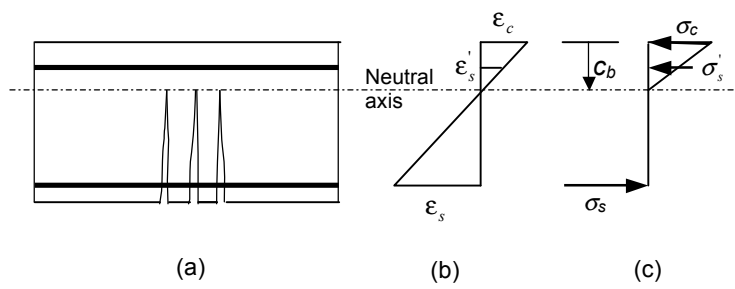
Stress and Strain Distribution of Cracked Reinforced Concrete Beam: (a) Geometry; (b) Strain; (c) Stress
